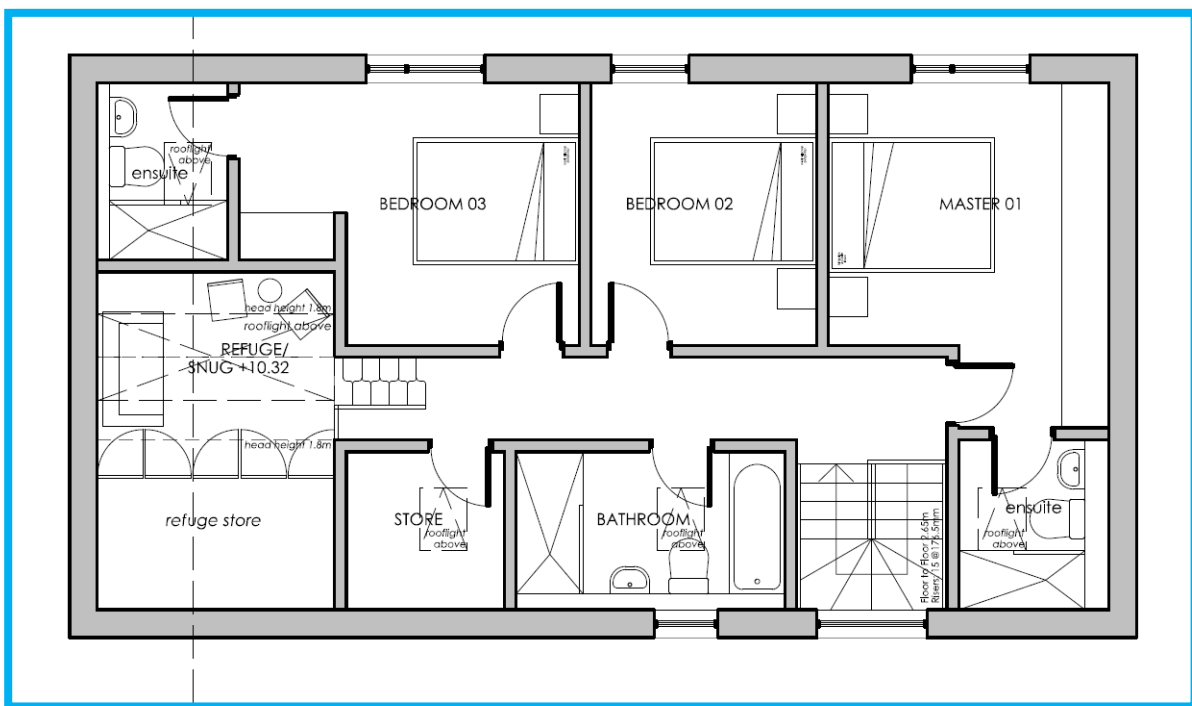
Proposed first floor with bedrooms and snug, serving as safe refuge (Mitchel Eley Gould).
